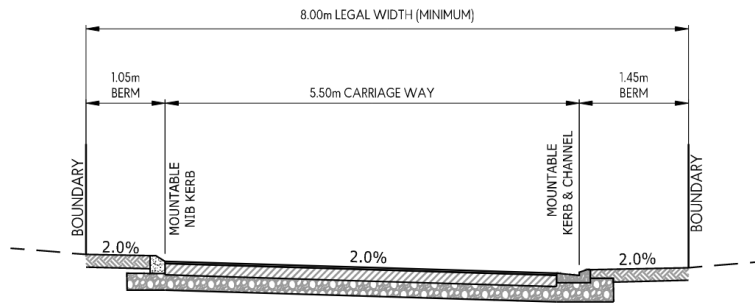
Typical JOAL Cross-Section (1) - 8.0m Minimum with Berms
